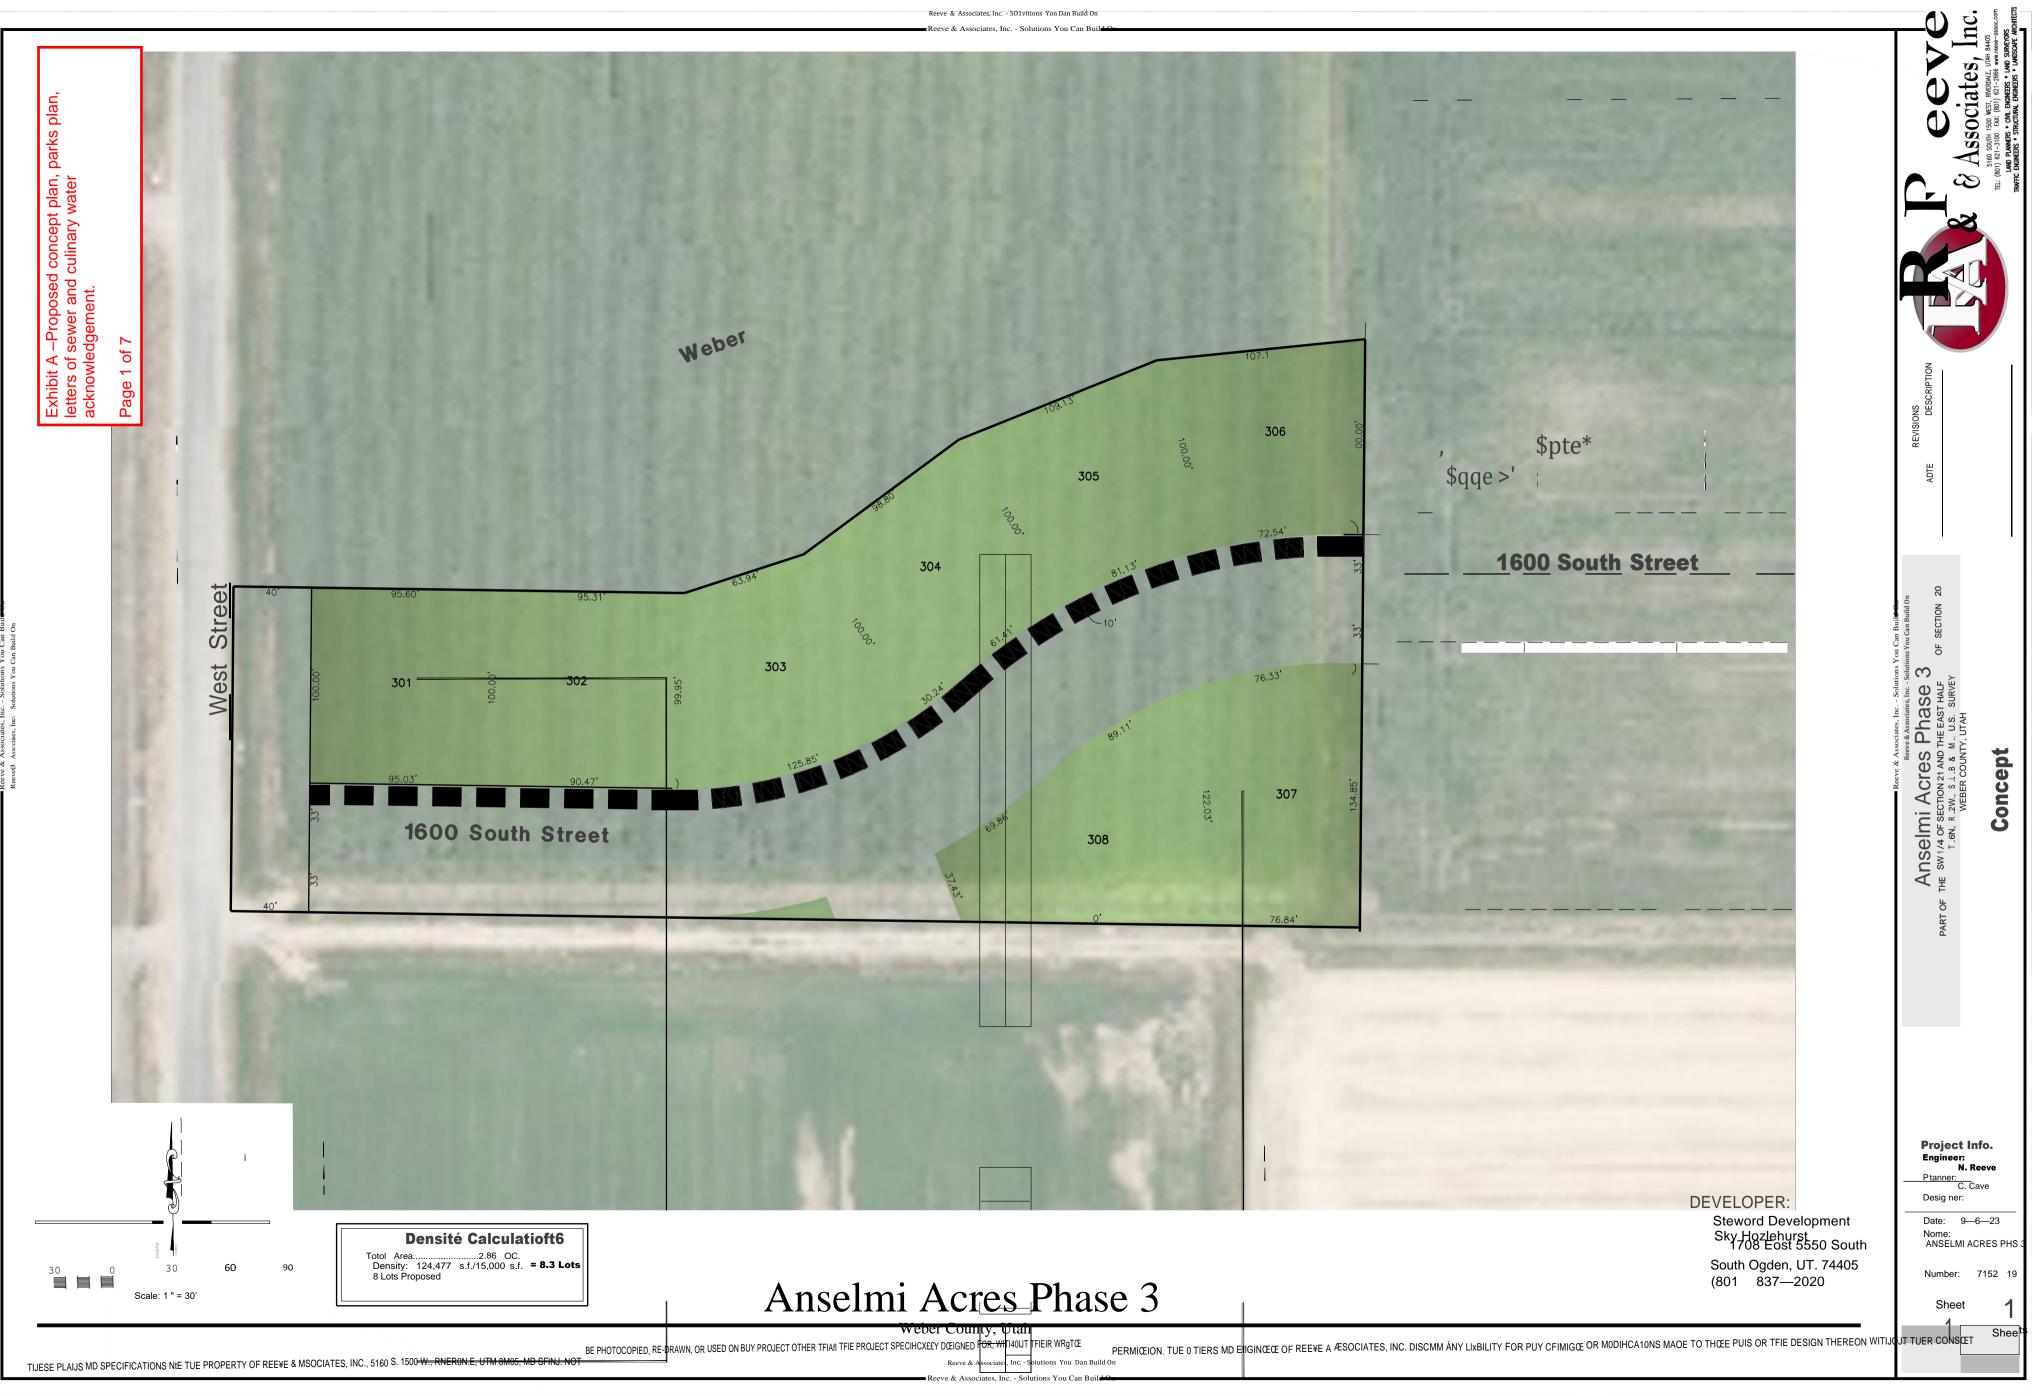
Exhibit A –Proposed concept plan, parks plan, letters of sewer and culinary water acknowledgement.
